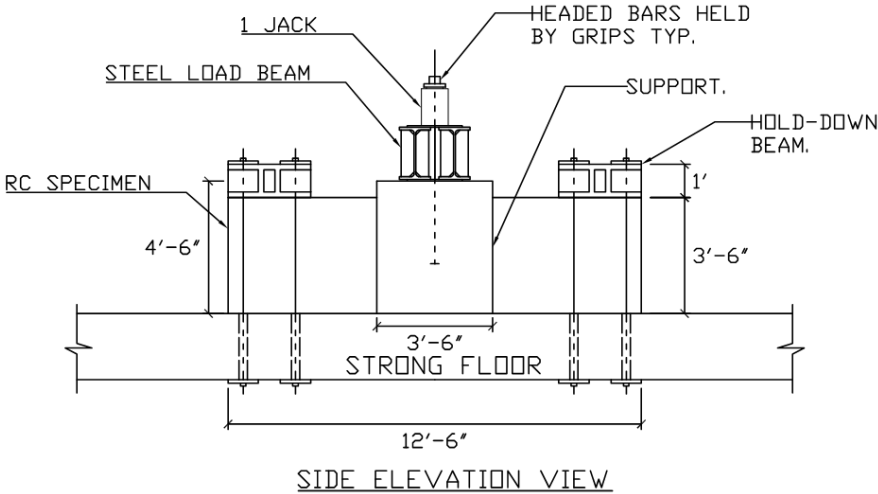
Side elevation view of test setup for specimens with one No. 14 headed bar
